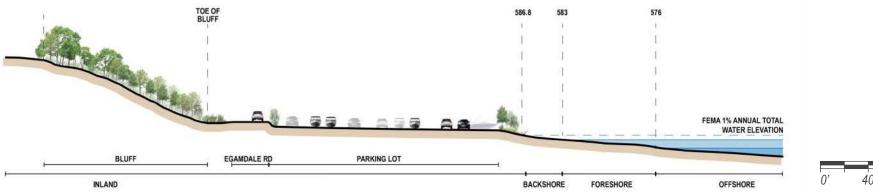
Cross Section of North Beach at Park Avenue Boating Facility
